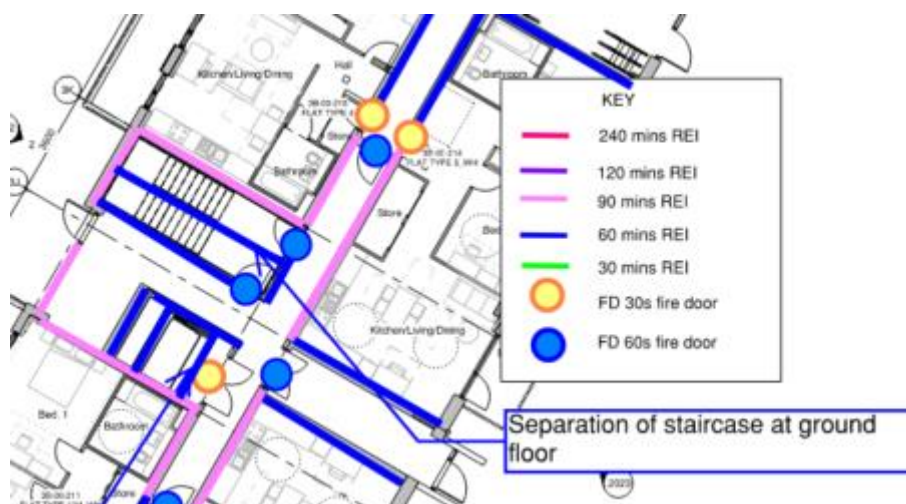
Separation of Staircase at Ground Floor (Block 3c)
